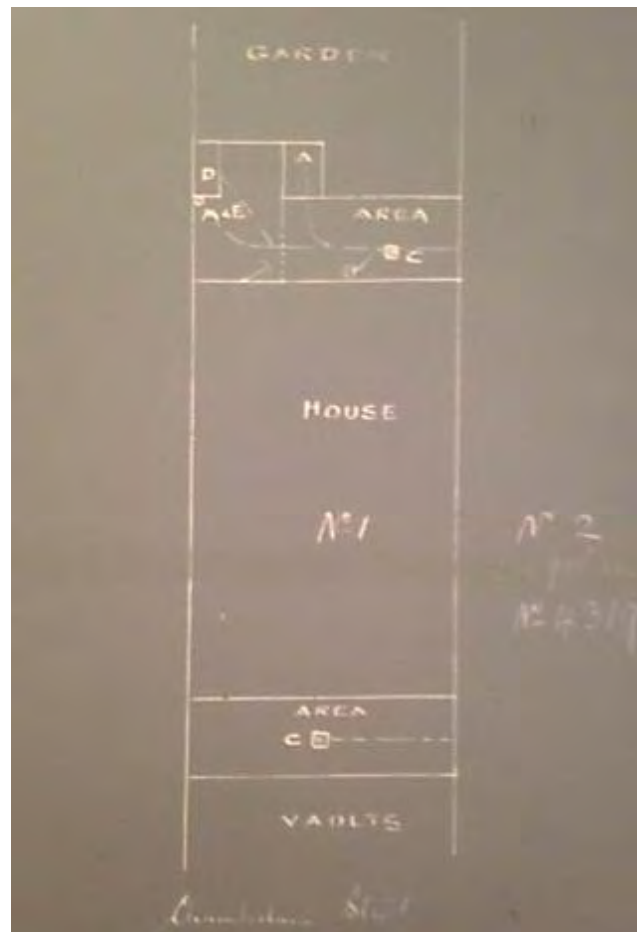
1899 Lower Ground Floor Drainage Plan¹⁰
